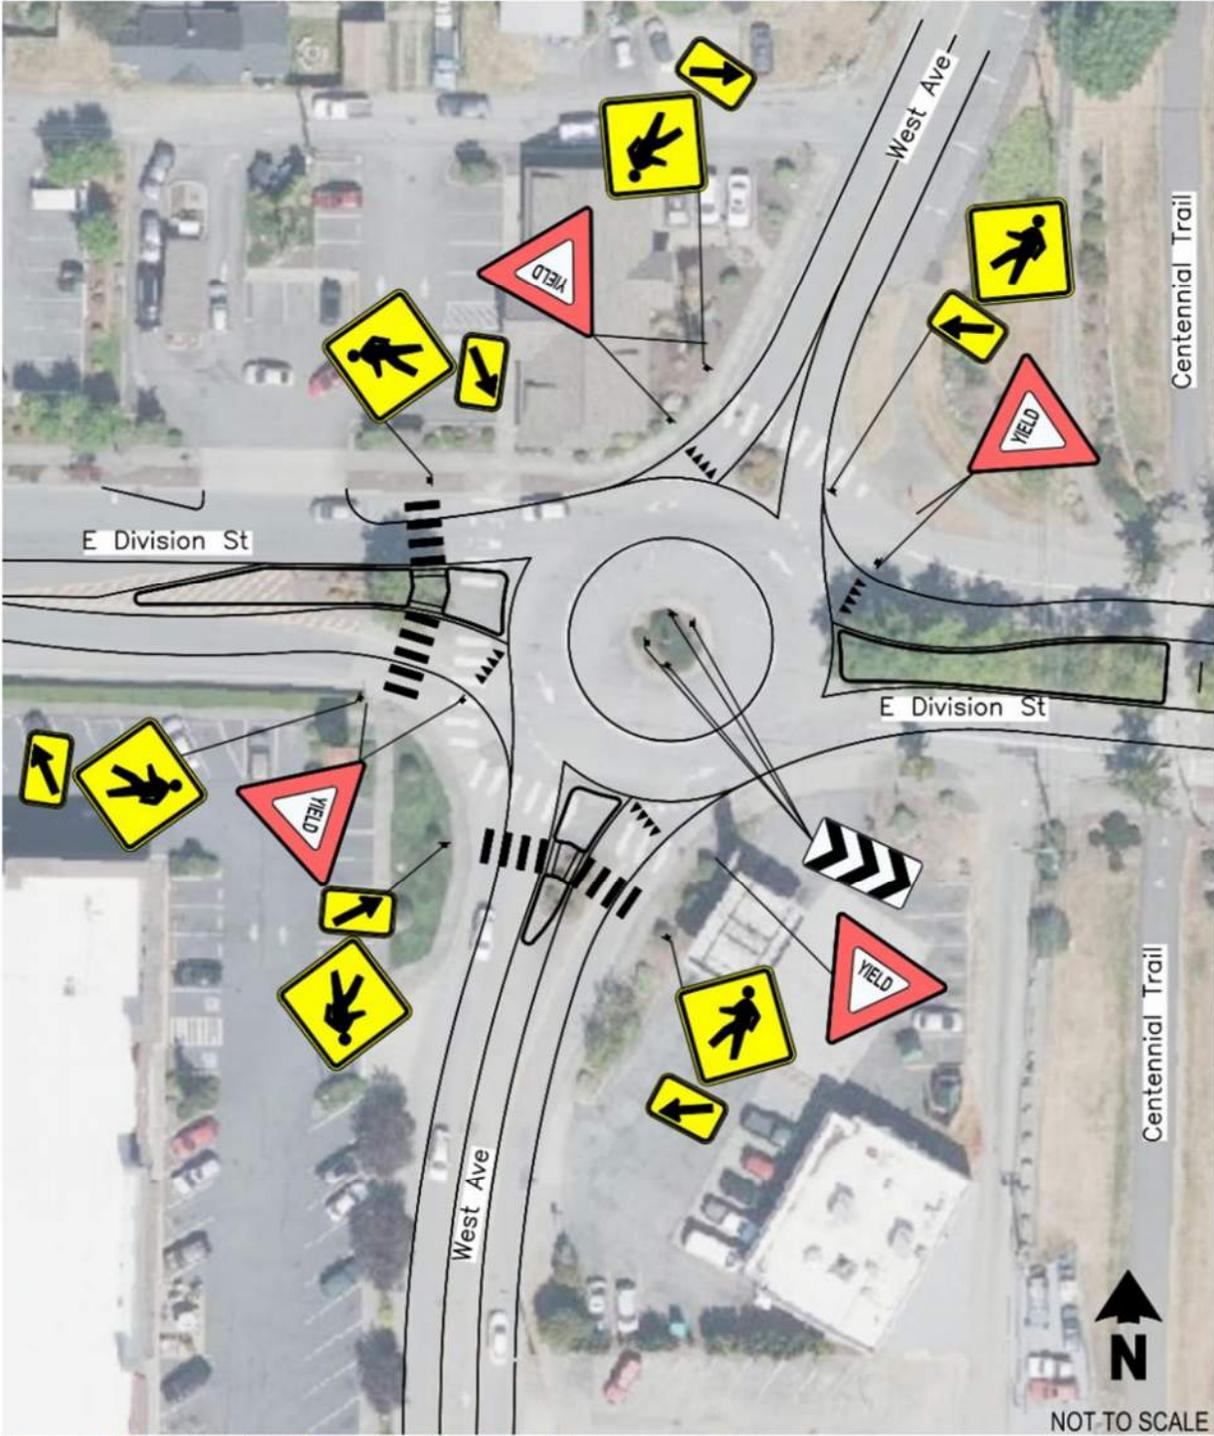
E Division St and West Ave Roundabout Improvement Concept
